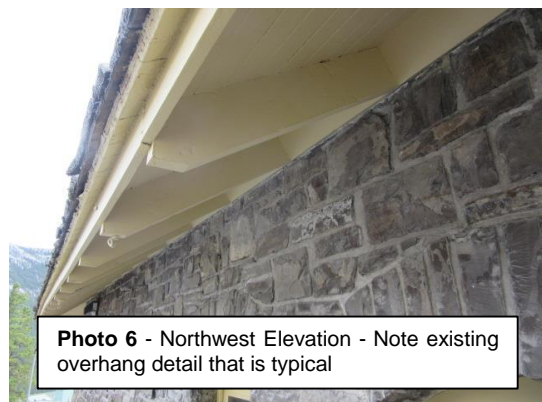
Northwest Elevation - Note existing overhang detail that is typical
